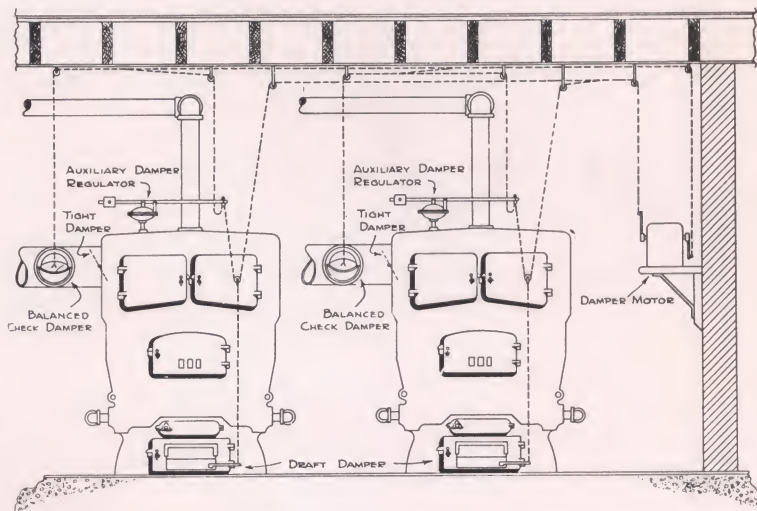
Method of Installing Damper Chains (Two Boilers)
